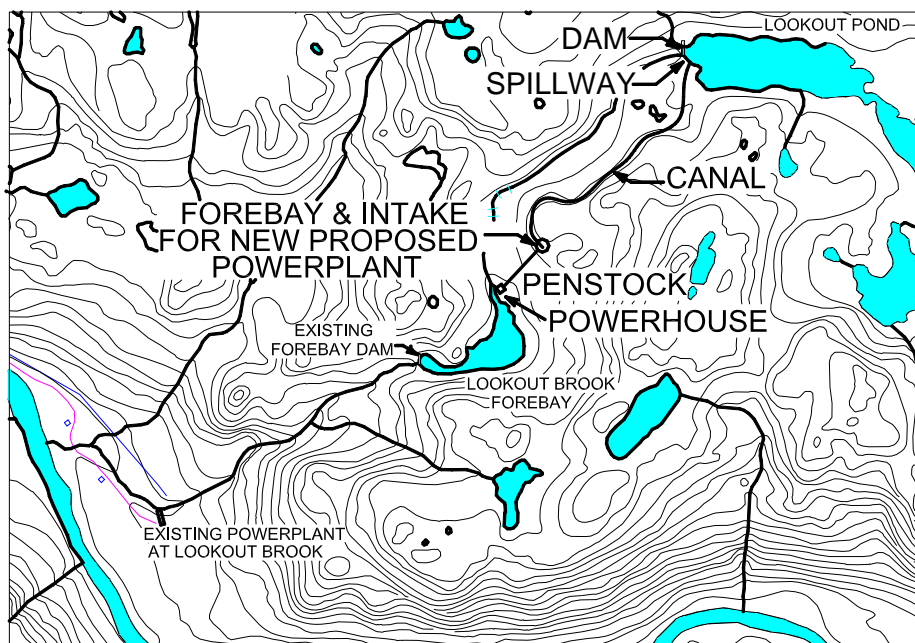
Conceptual Layout of Proposed Plant on Lookout Pond
